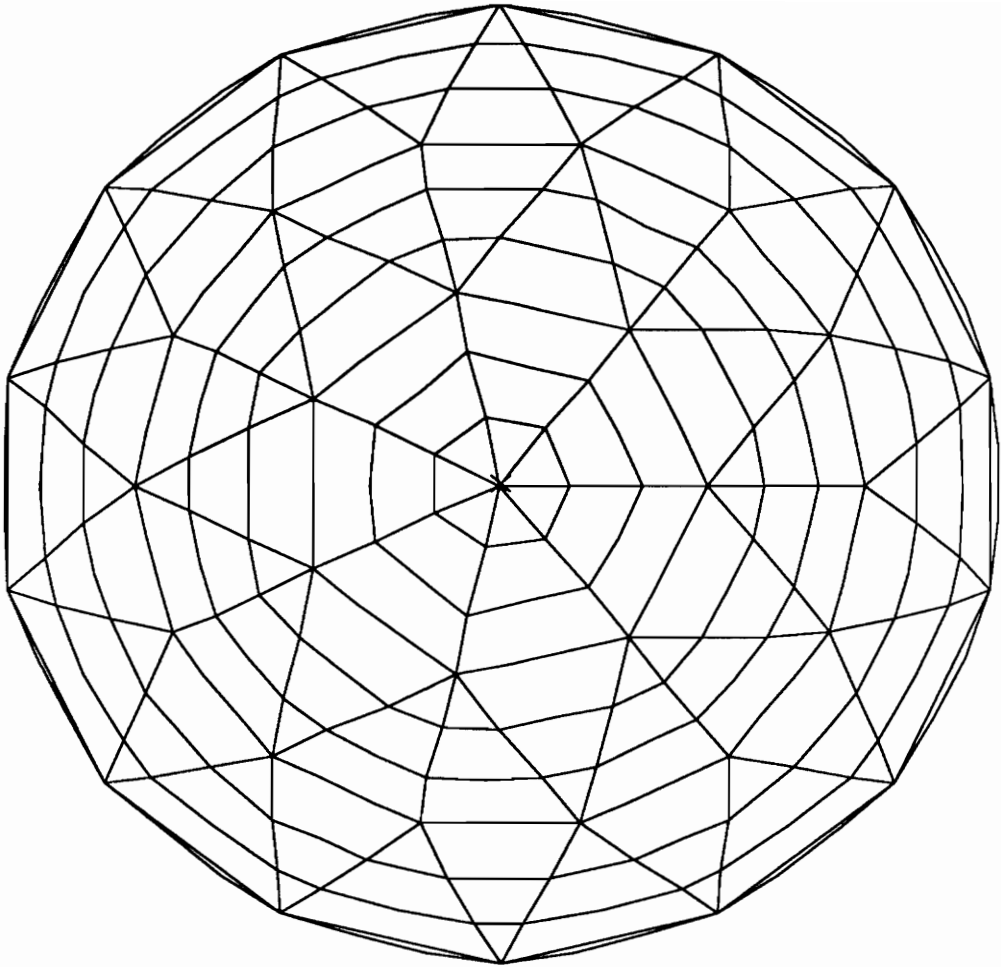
Beams, purlins and steel ring for entire dome.
